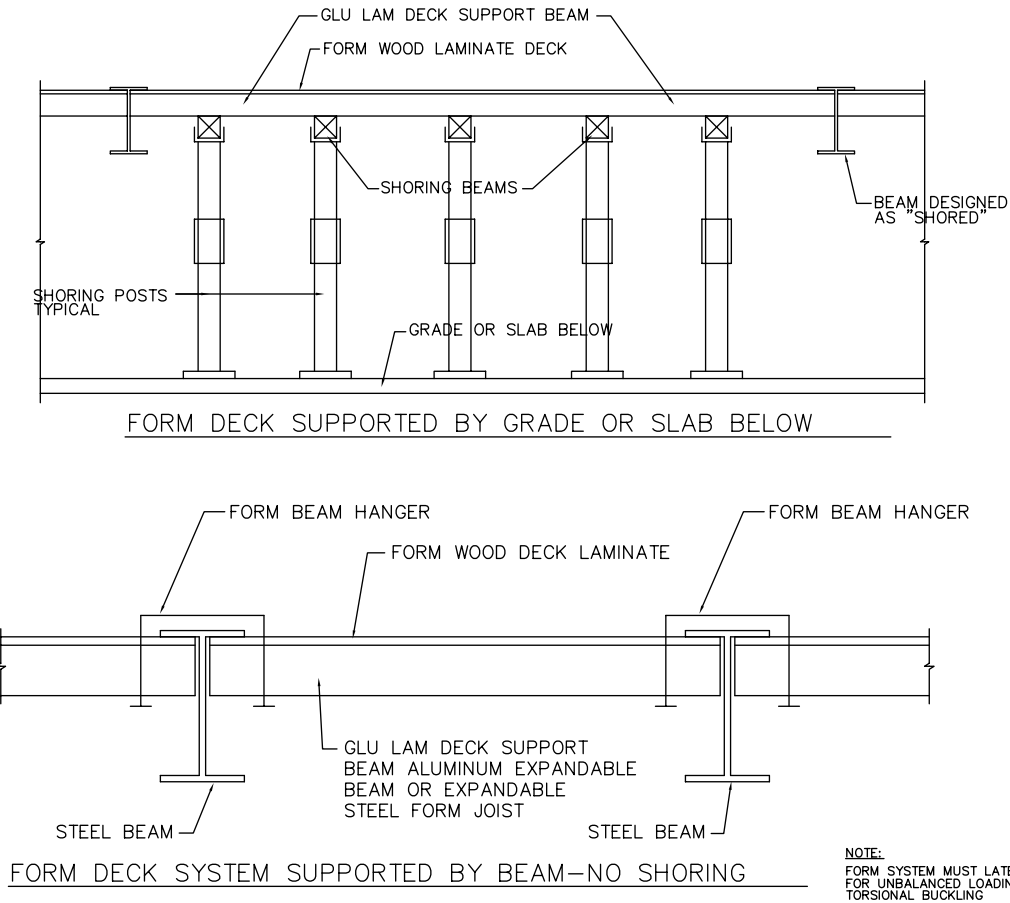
Form Deck System Supported by Beam—No Shoring
